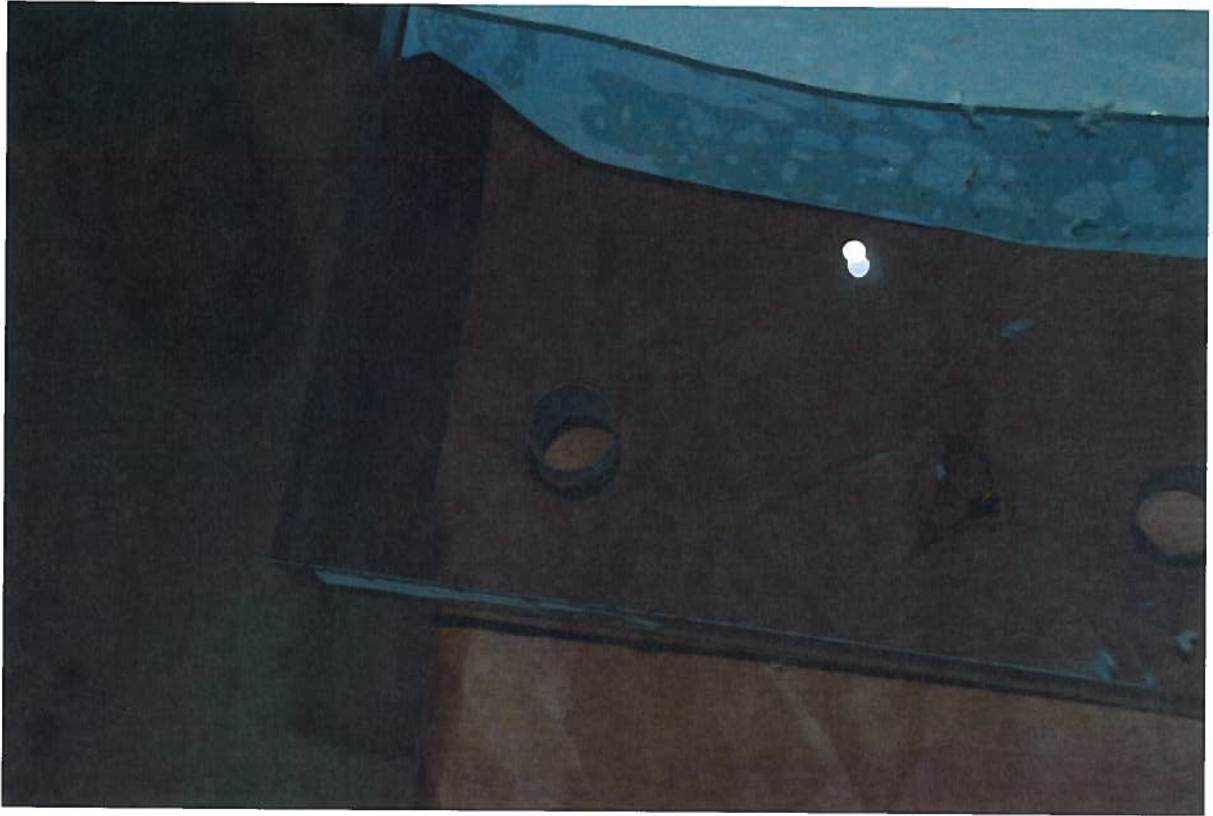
Bolt Hole Drilled in Polycarbonate Panel
